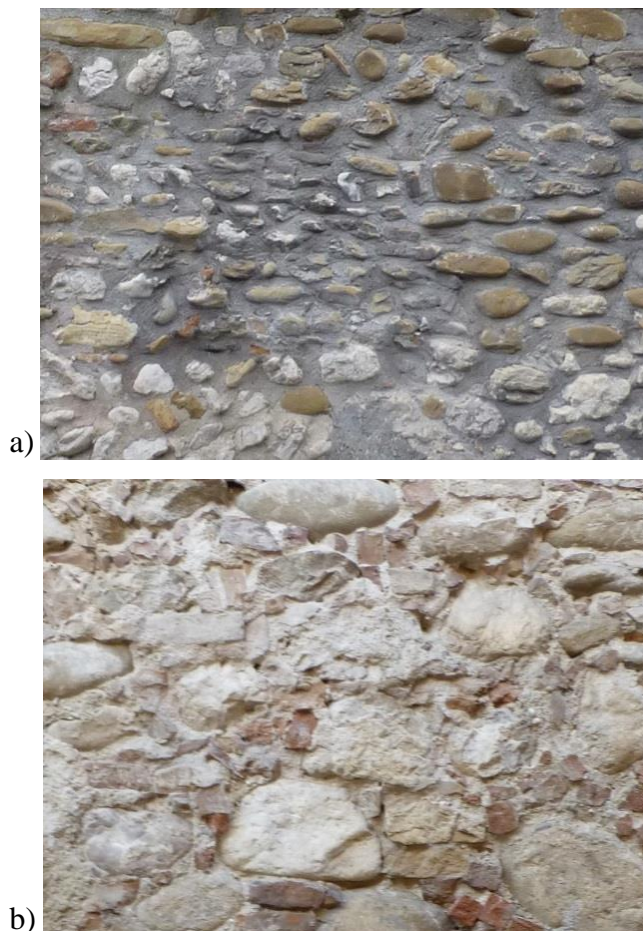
Some masonry samples of the aggregate. a) Ground floor, via Sant'Antonio (Figure 1), b) Basement floor, dwelling, façade on via Stazio
